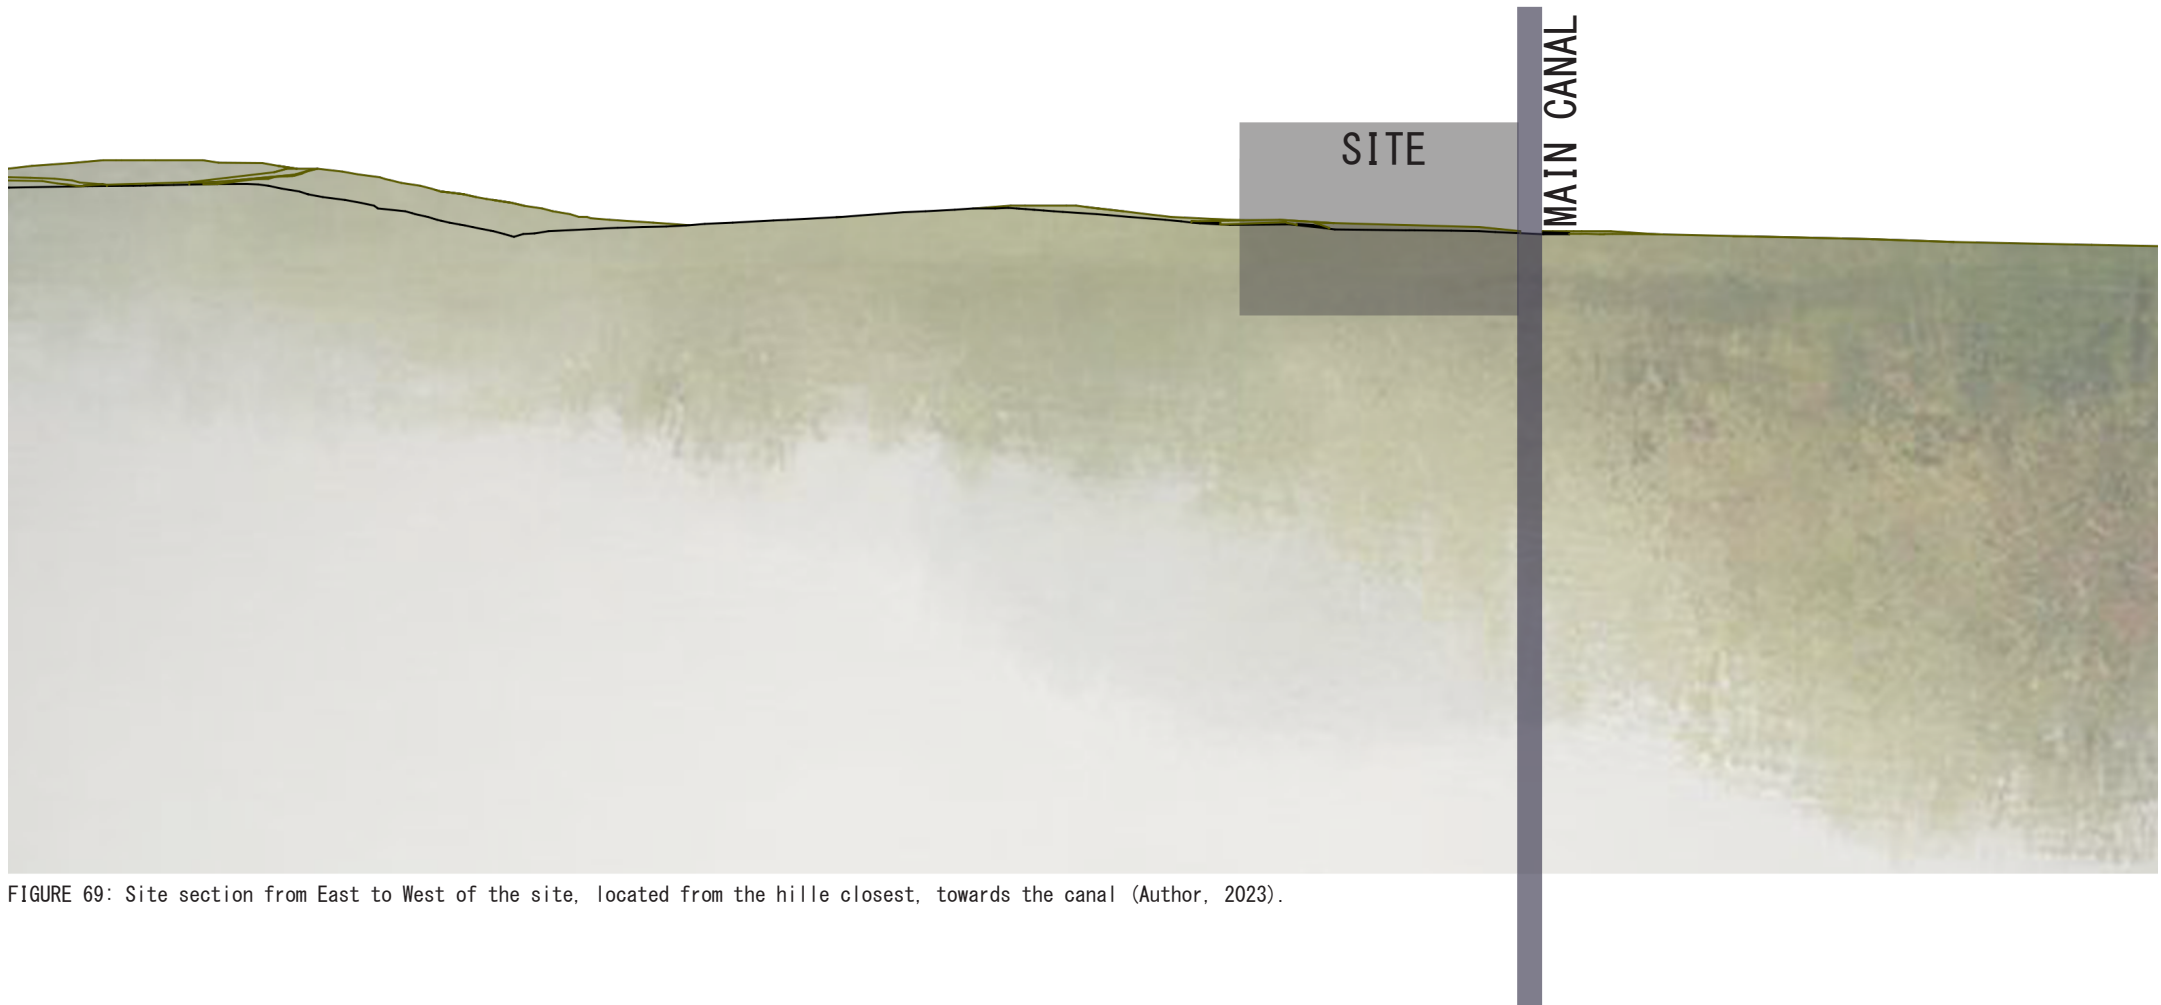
Site section from East to West of the site, located from the hille closest, towards the canal (Author, 2023).
